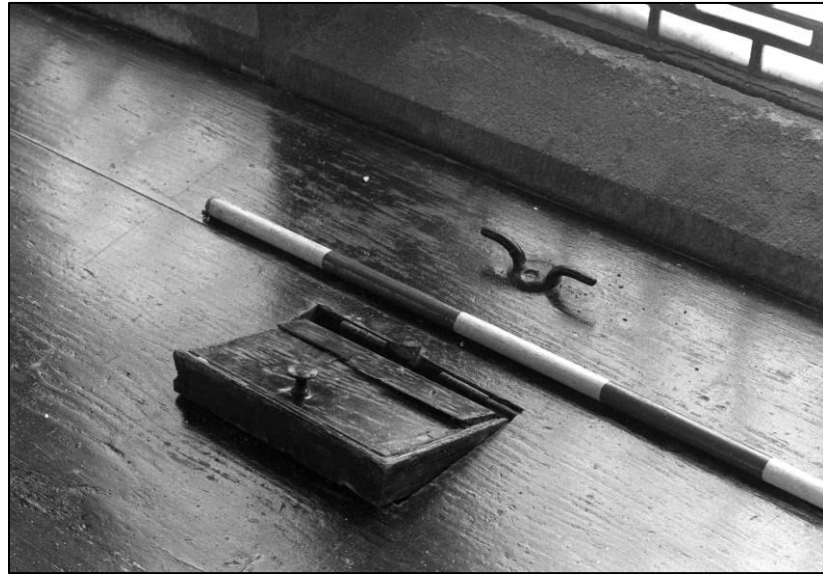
Church: 1F gallery, typical heating vent in windows, looking W (photo 4/6).
